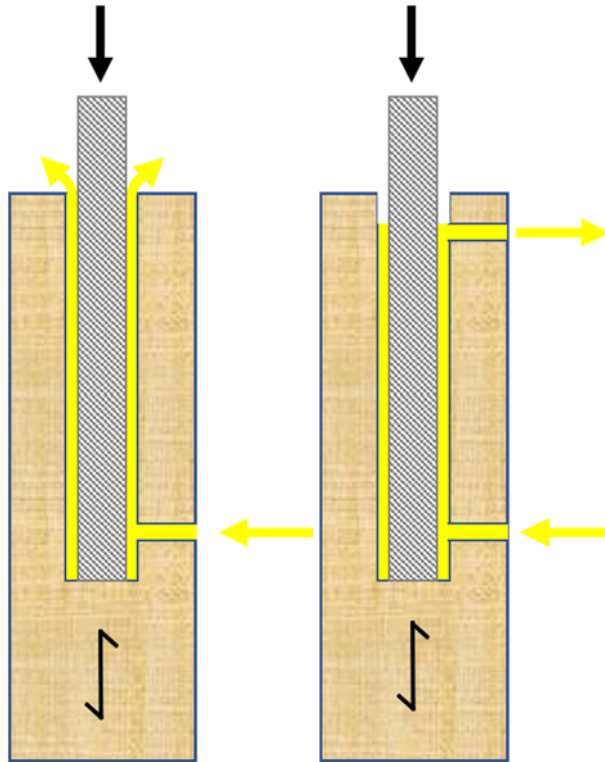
Assembly method with two holes drilled perpendicular to the timber element. . Image reproduced with inspiration from (Steiger, et al., 2015).
